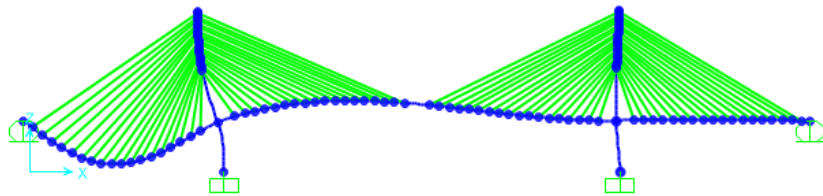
Deformation of Bridge under 50kN/m Live Load at the Side Span of Bridge
